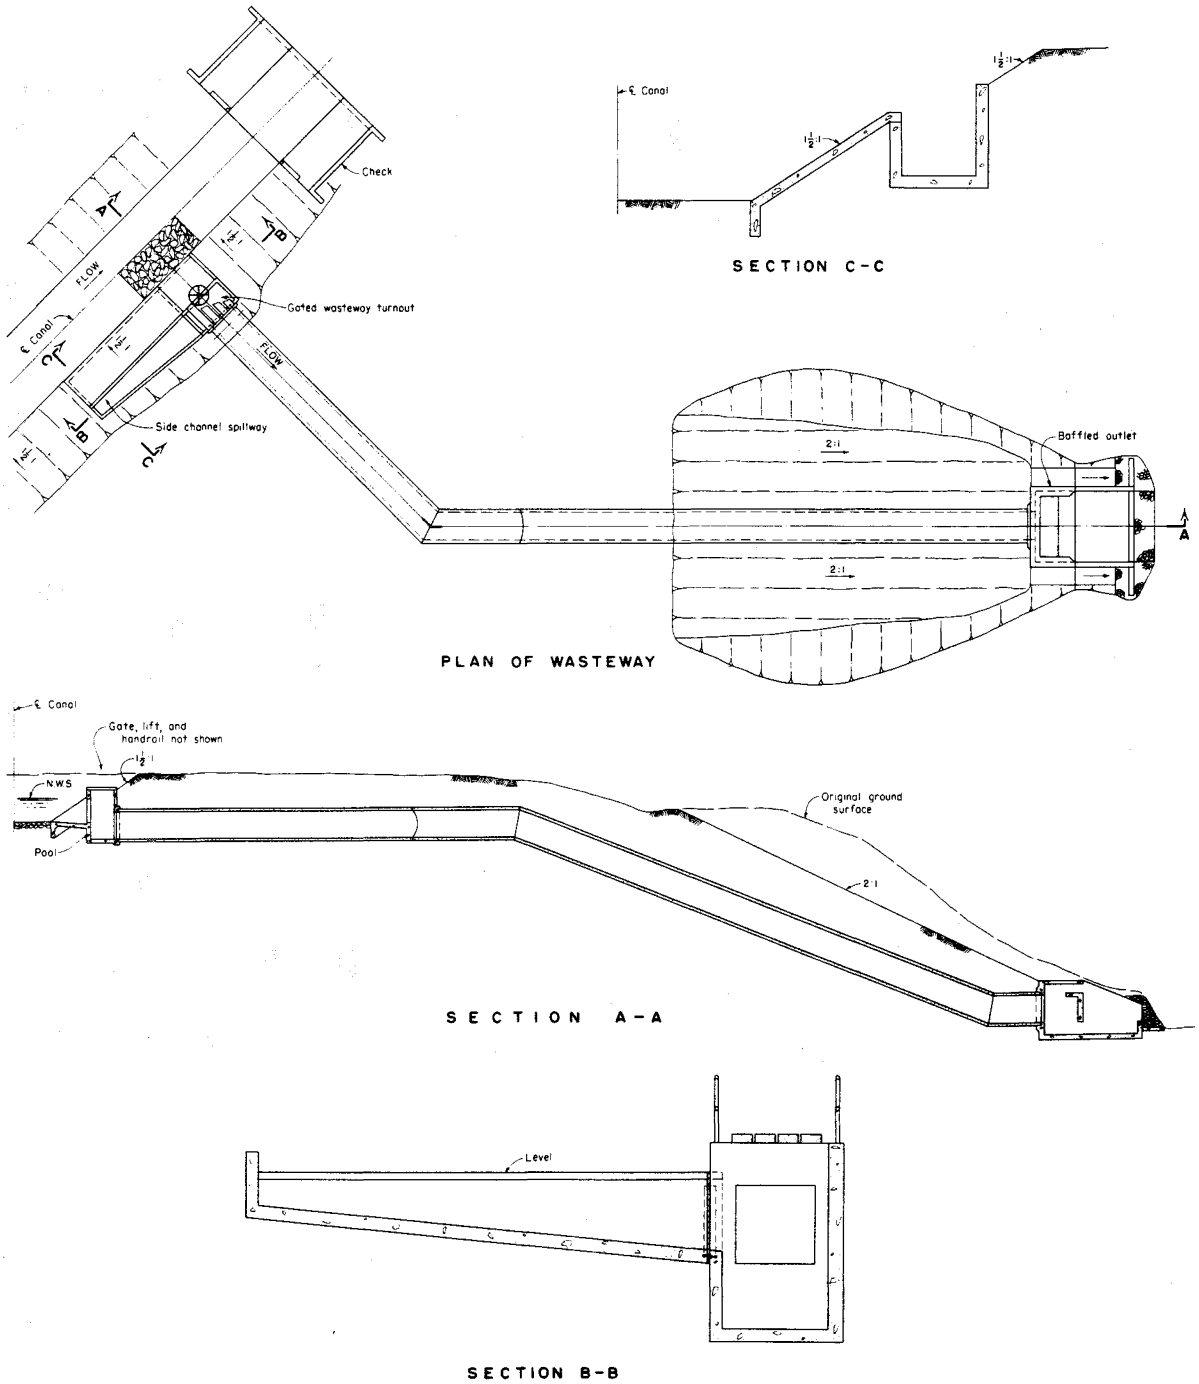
Side channel spillway used as a wasteway turnout. 103-D-1294
